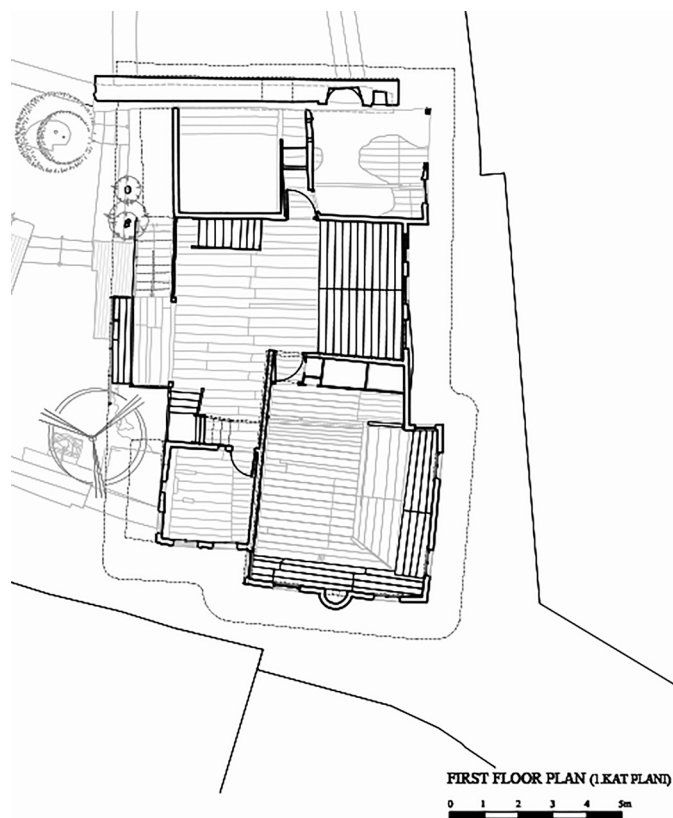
Kerimağa* House, *Birgi*, first-floor plan.
